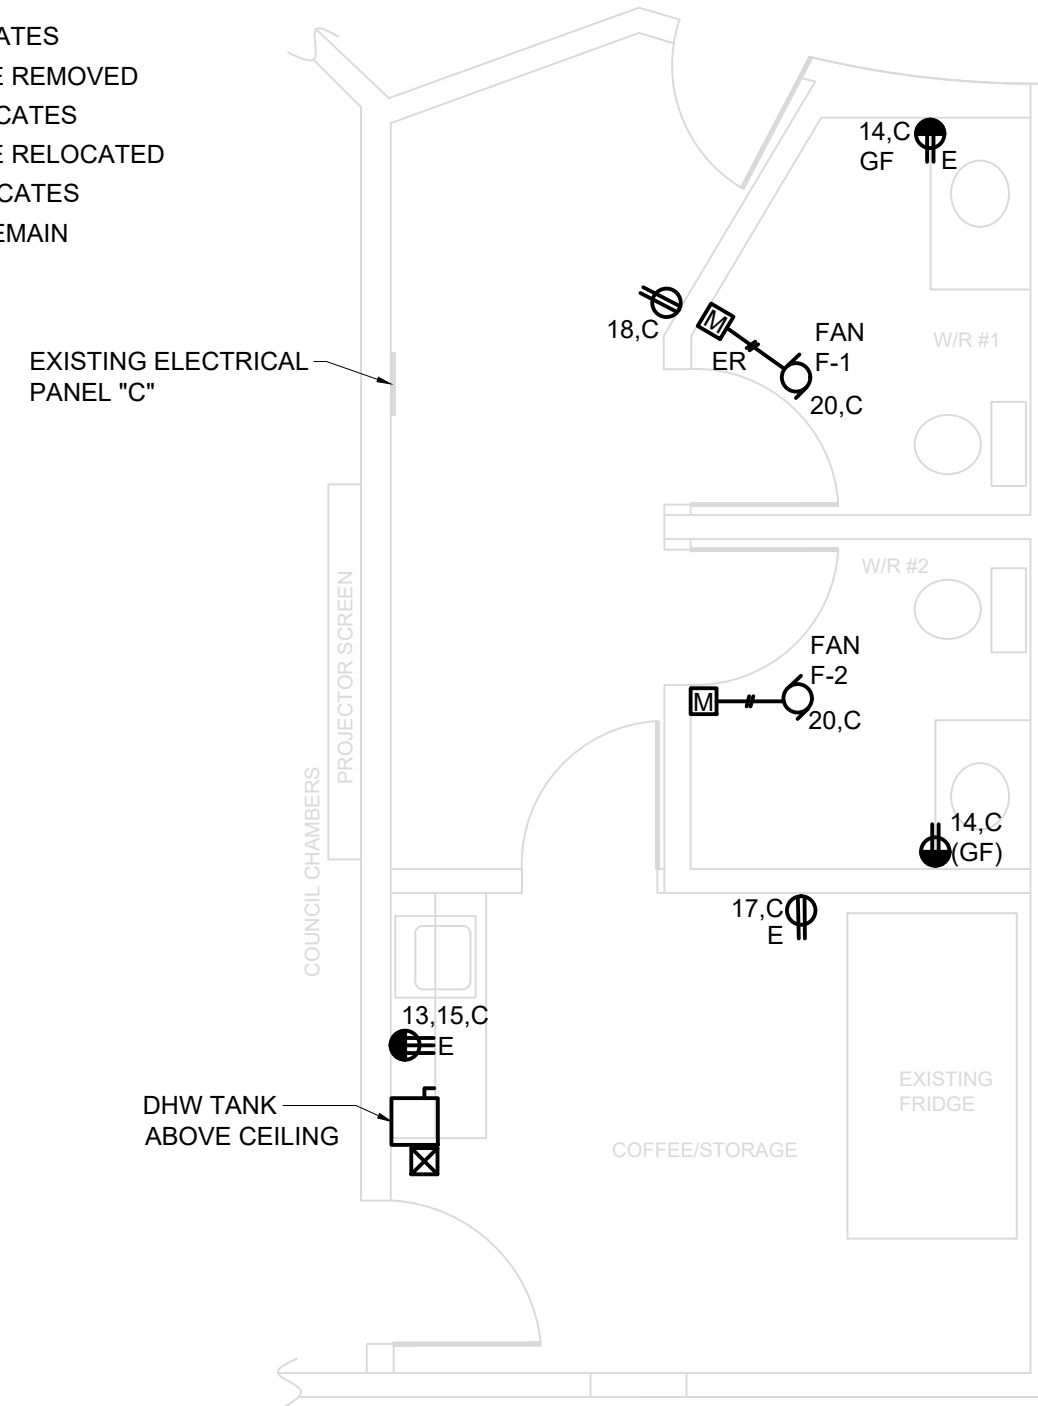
REVISED ELECTRICAL LAYOUT
